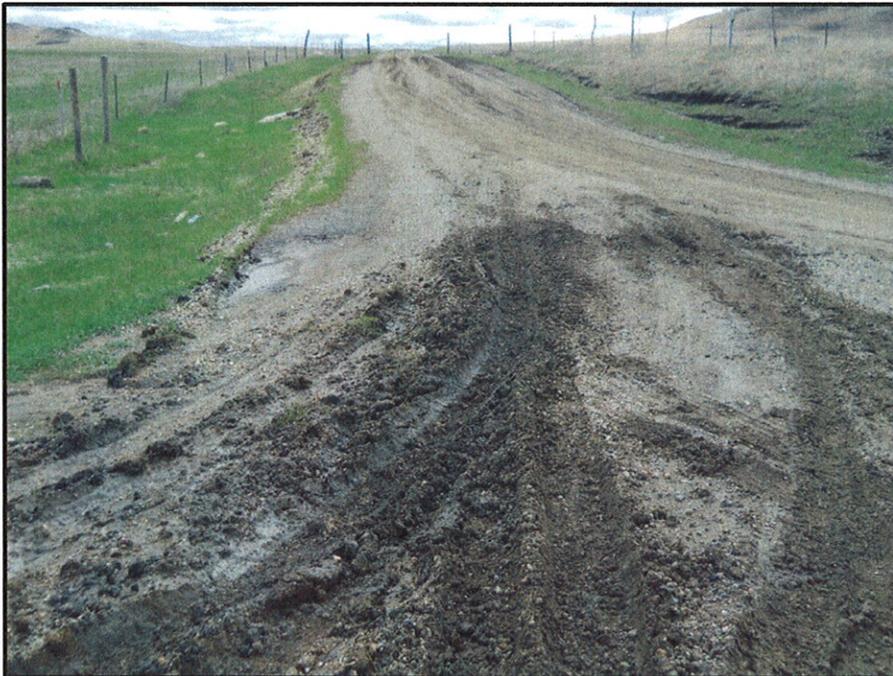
The east end of the proposed Hale Marina Road improvement project at the intersection of BIA 13 and Hale Marina Road. BIA 13 is behind the photographer and the view is east along the Hale Marina Road. Source: Atkins, May 12, 2011.
